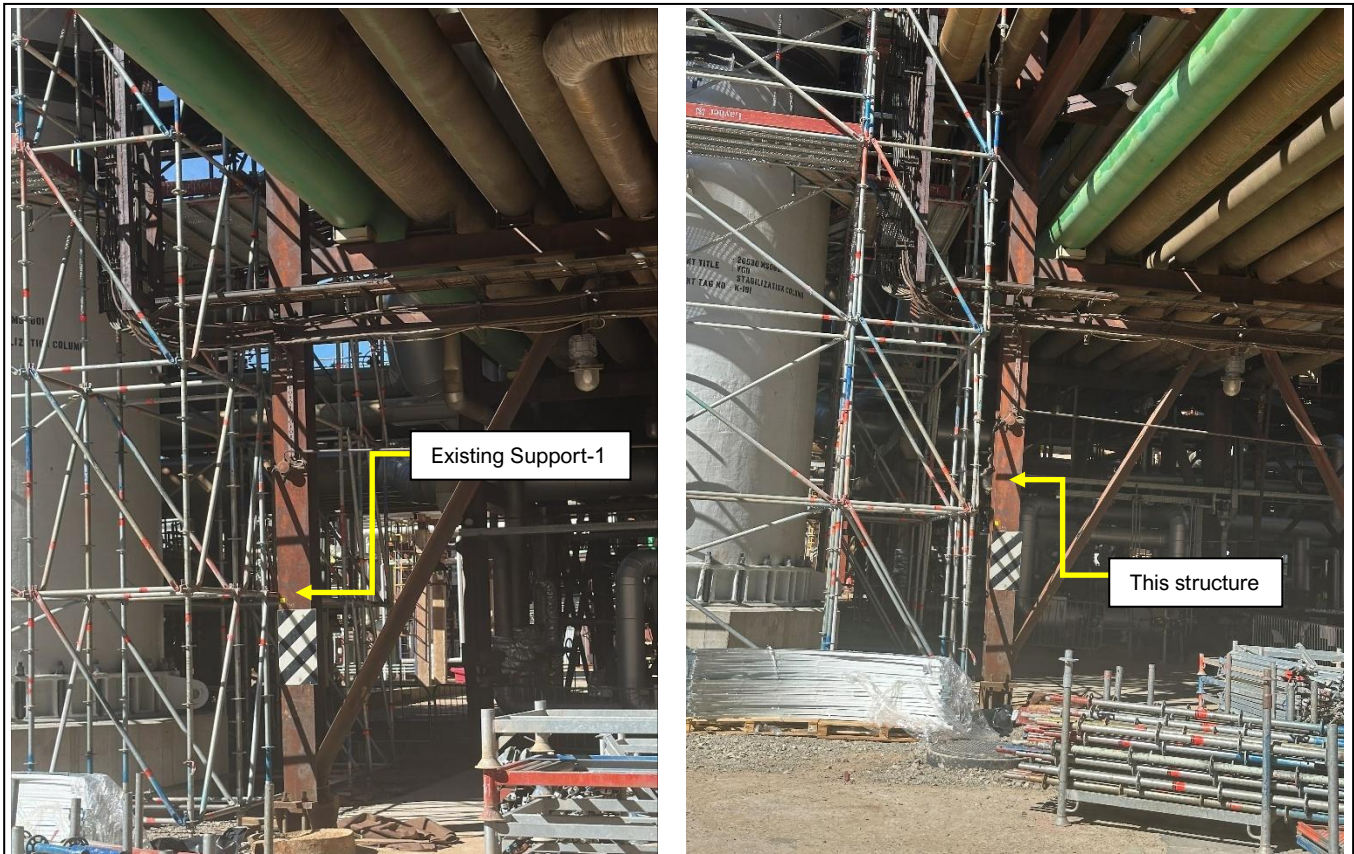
Site Photo of Existing Support-1 around New Column K-101 within FSE.
